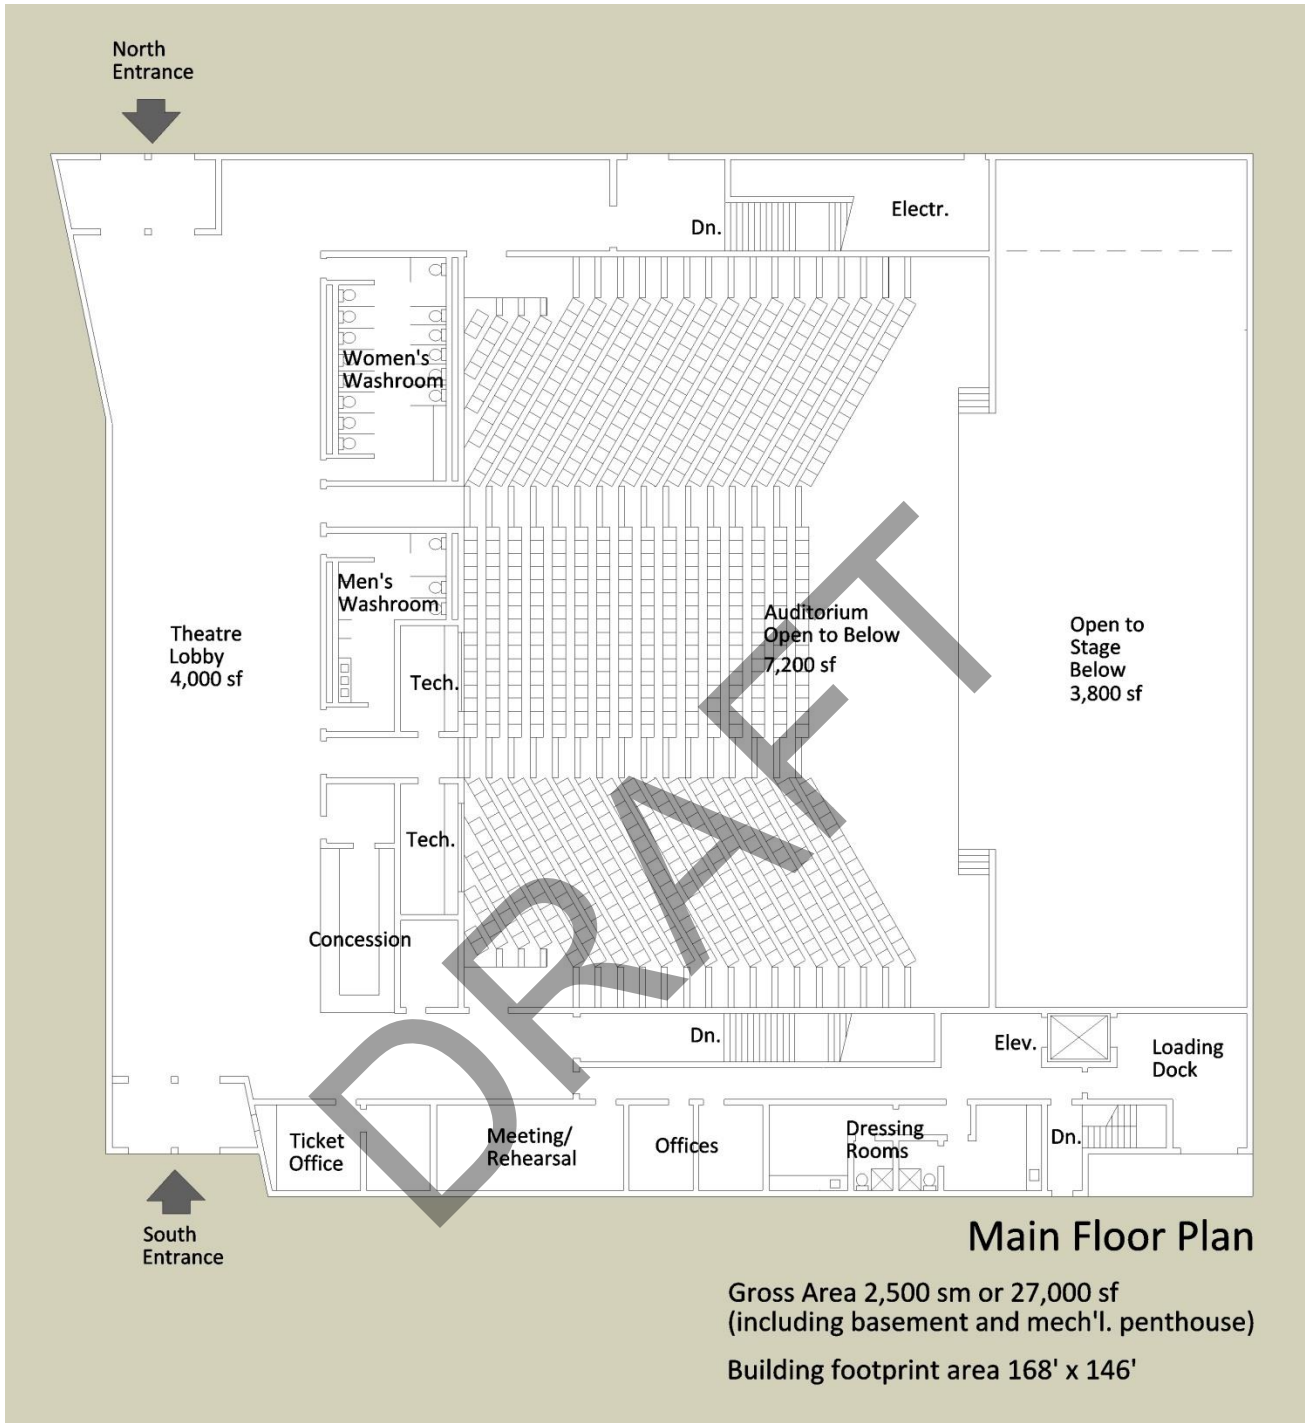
Conceptual Floor Plan for 800 Seat Concert Hall (D. Hewko 2019)
